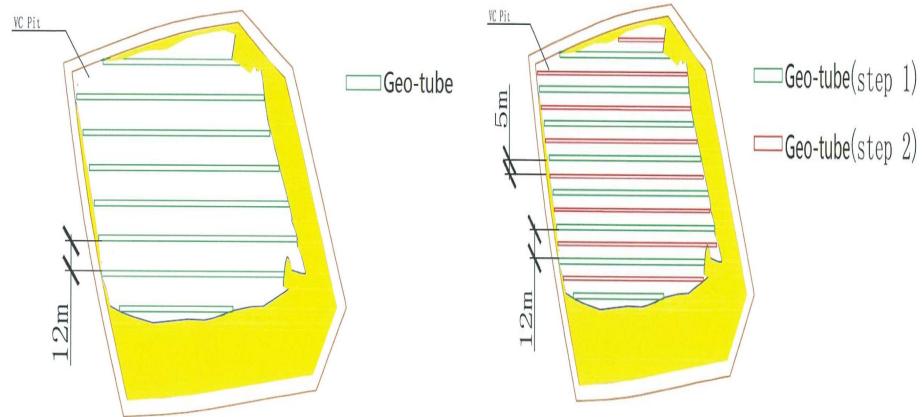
Placement sequence of geotube over the installed geotextiles
